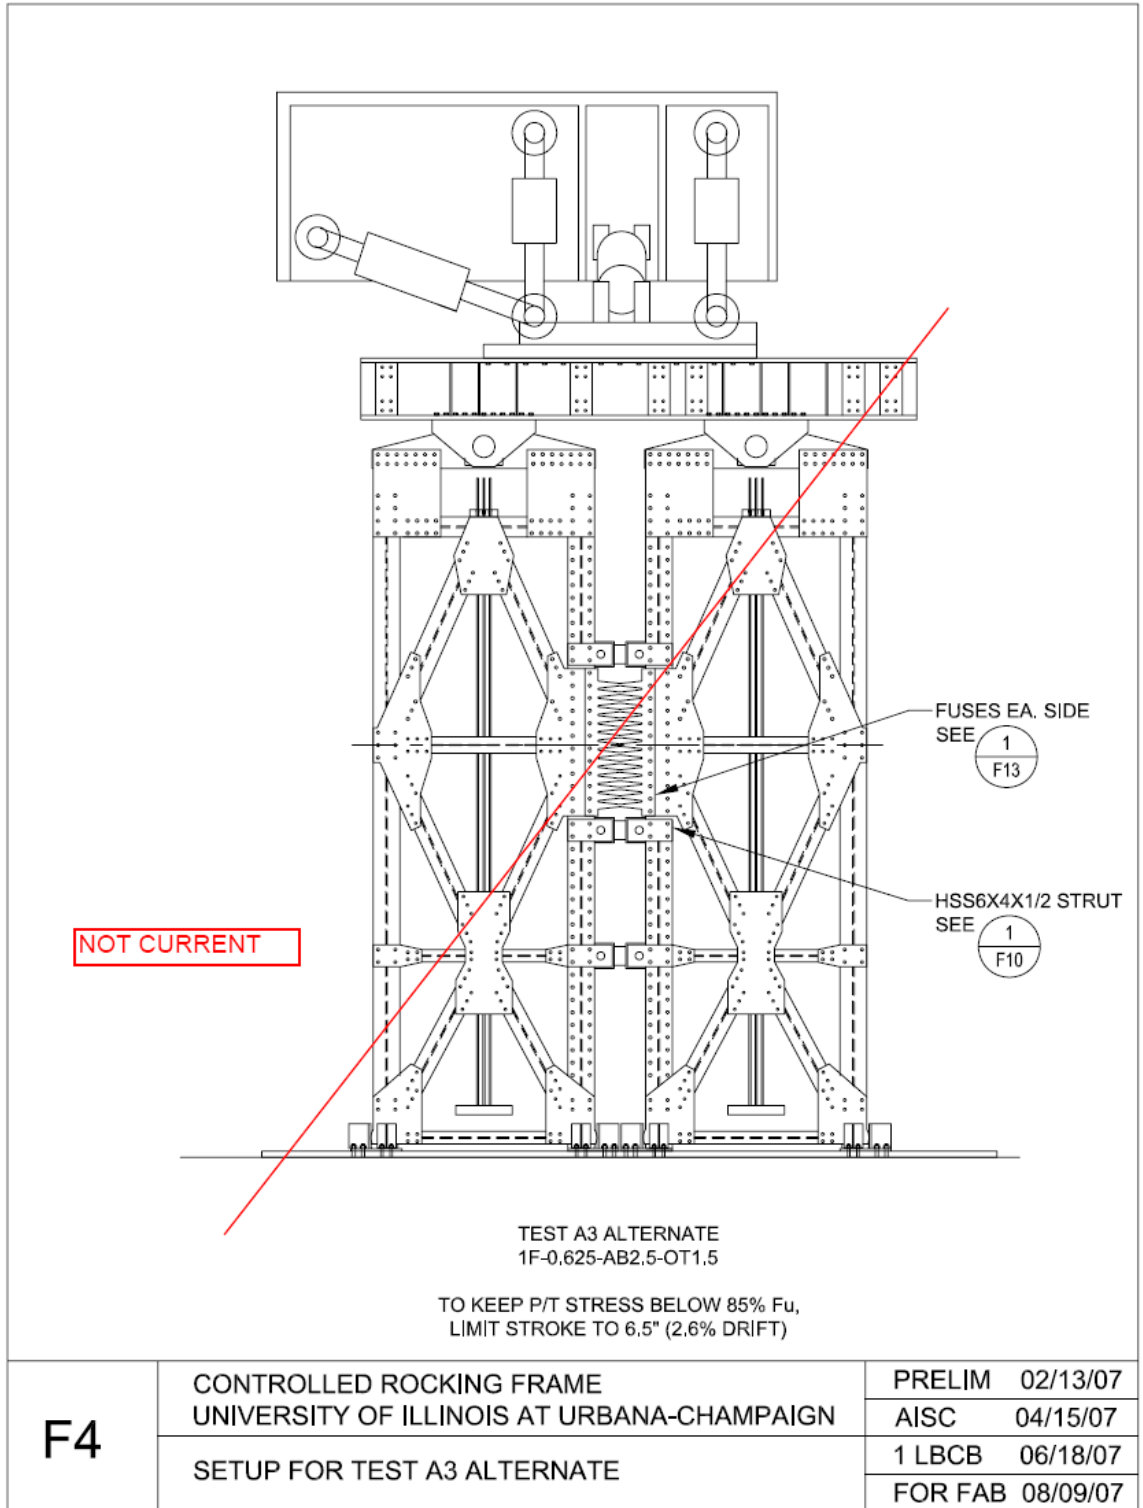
Specimen Design Drawing – Setup for Test A3 Alternate
